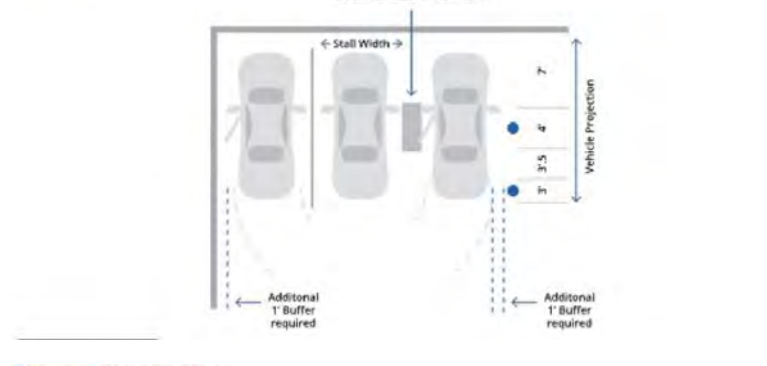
// Dimensional Standards for Parking Adjacent to Columns or Side Walls
